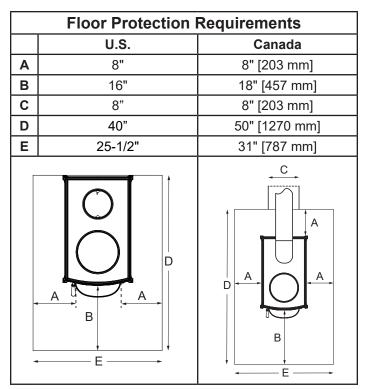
These dimensions are minimum requirements only. Use greater dimensions whenever possible.
